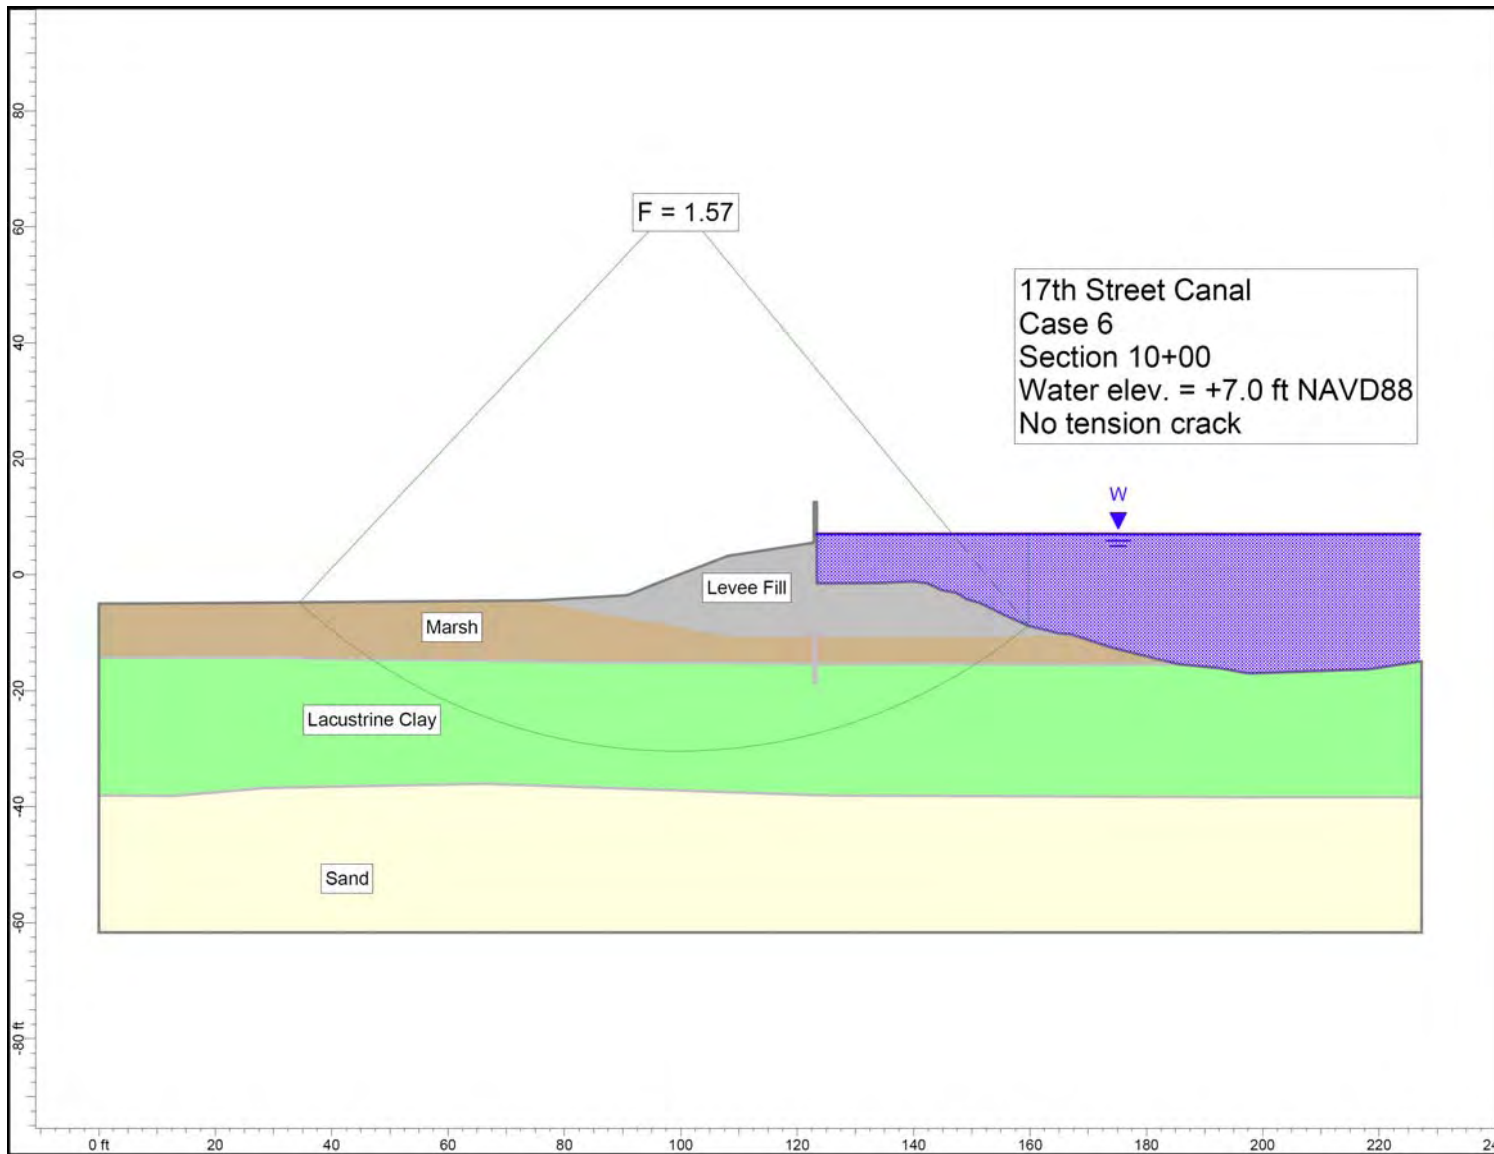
Critical Circle for 17th Street Canal Station 10+00 – Water Elevation 7.0 ft, No Tension Crack
